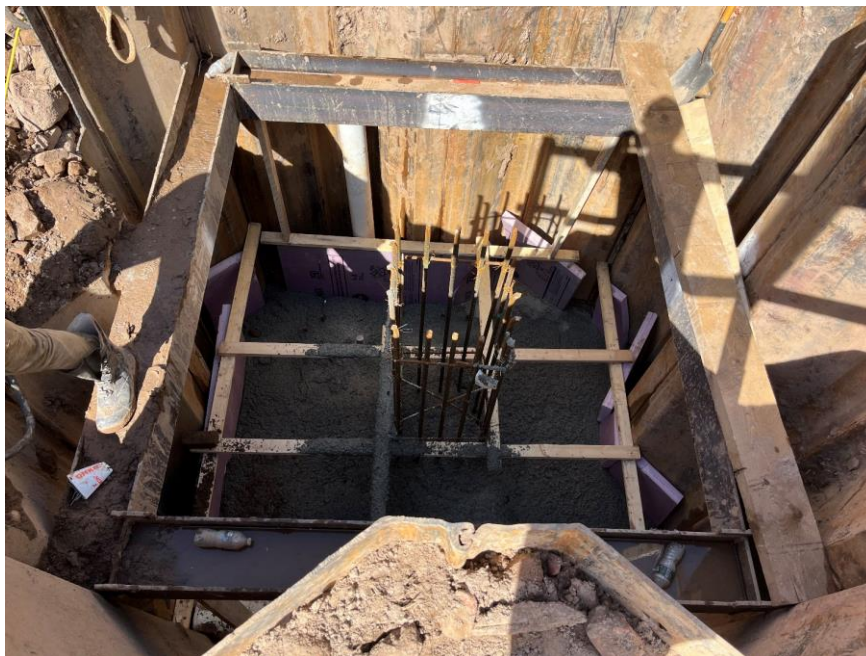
View of pile cap construction progress in the southwestern portion of the site (facing east).
